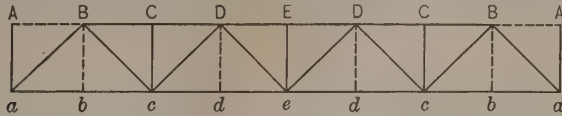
(b). Deck Warren Truss (With Verticals). (See photograph, page 105.)
